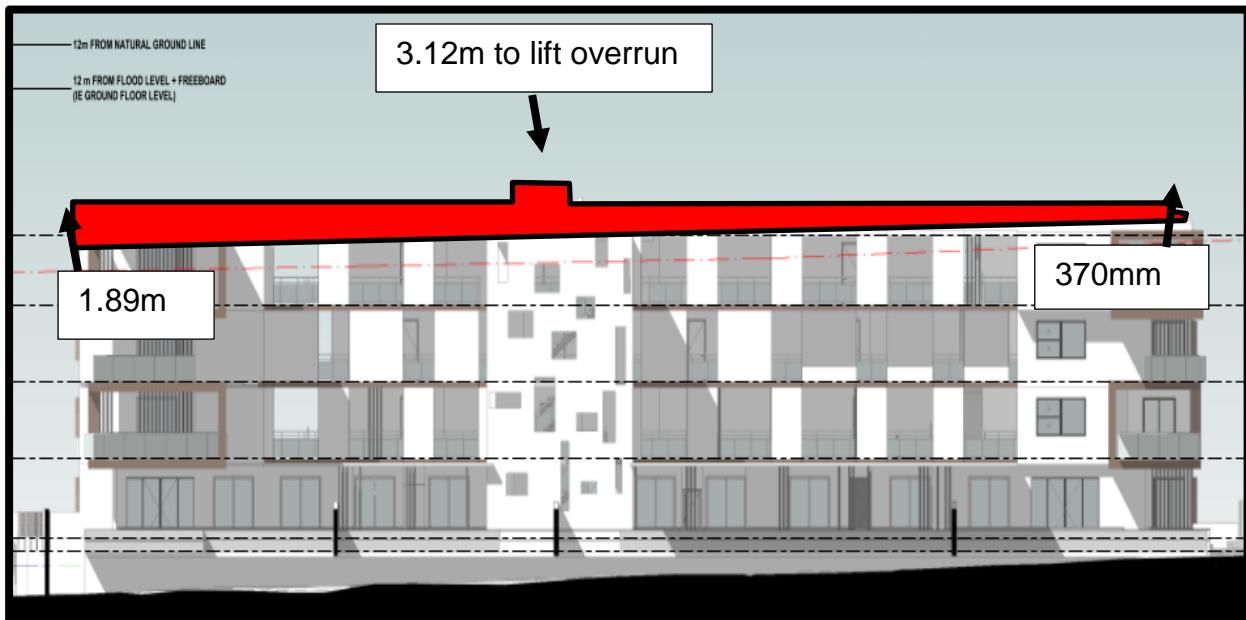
Height Exceedance from existing NGL from south elevation Building D (pre-fill)
